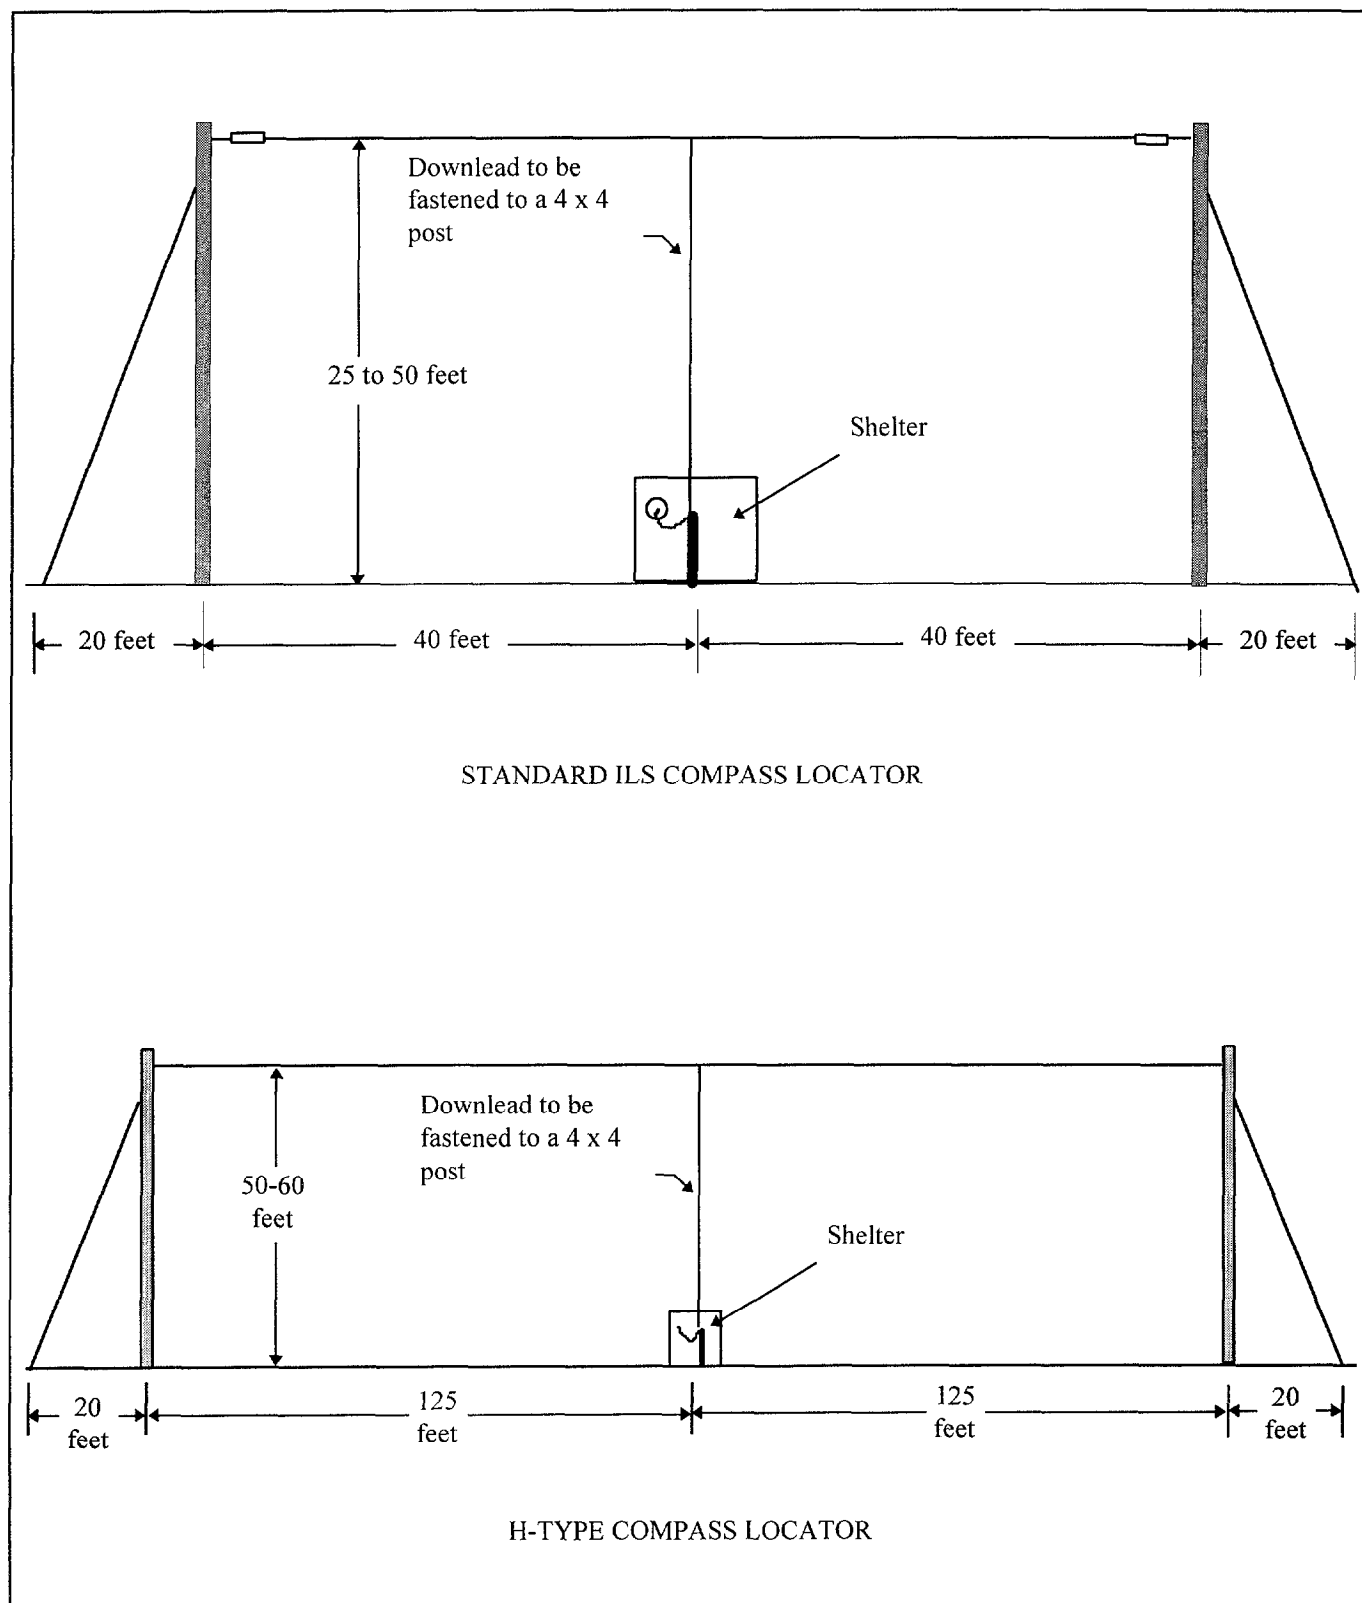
COMPASS LOCATOR ELEVATION AND PLOT SIZE REQUIREMENTS
